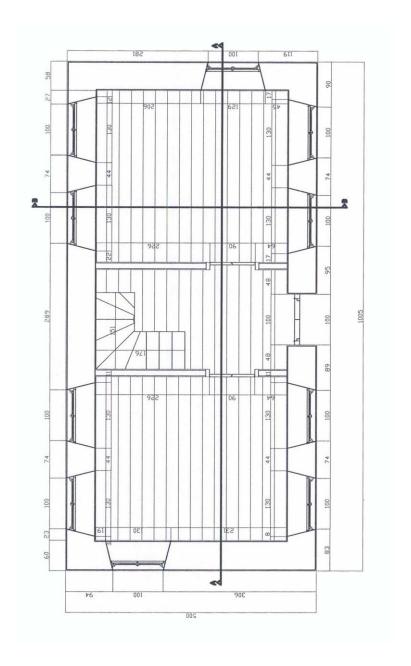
First Floor Plan of 11-Hamam Street Scale: 1/75
